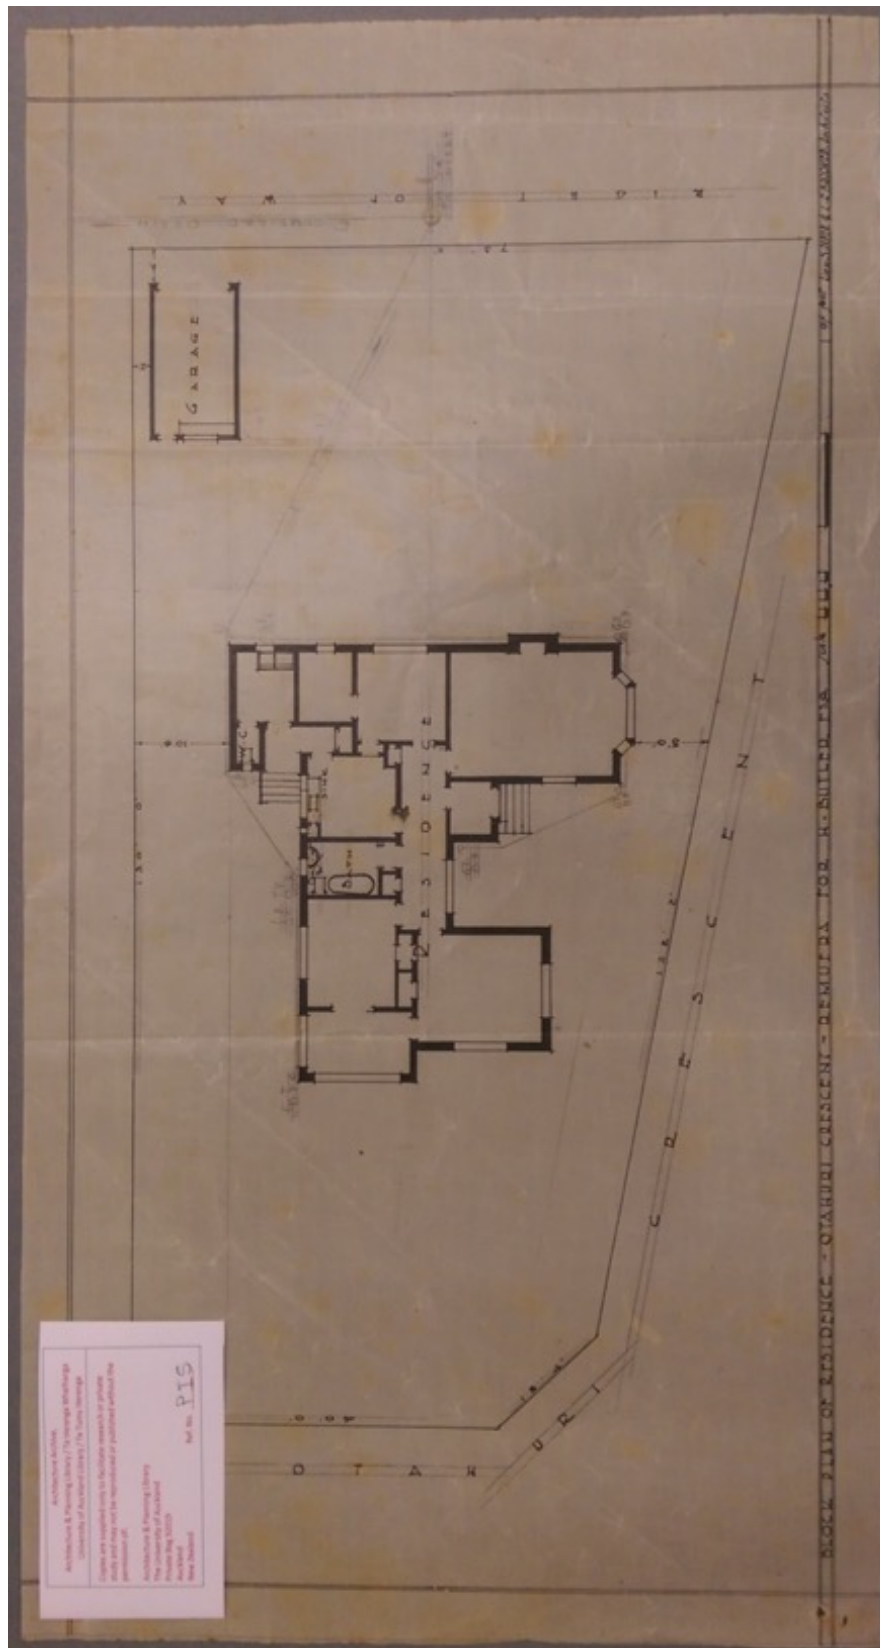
Block plan showing the proposed residence and garage at 3 Otahuri Crescent, 1931. The plan shows the architects' names as Llew S. Piper and L. E. Brooker (PI5, Llew S. Piper Collection, Architecture Archive, University of Auckland Libraries and Learning Services).
